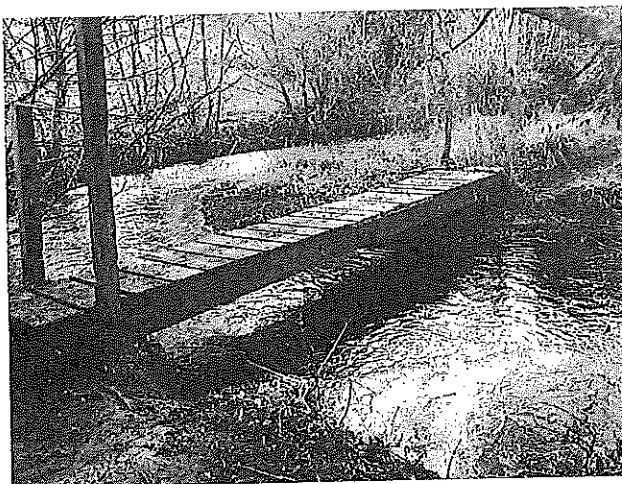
Footbridge at entrance G. Note steps at ends and lack of handrail
